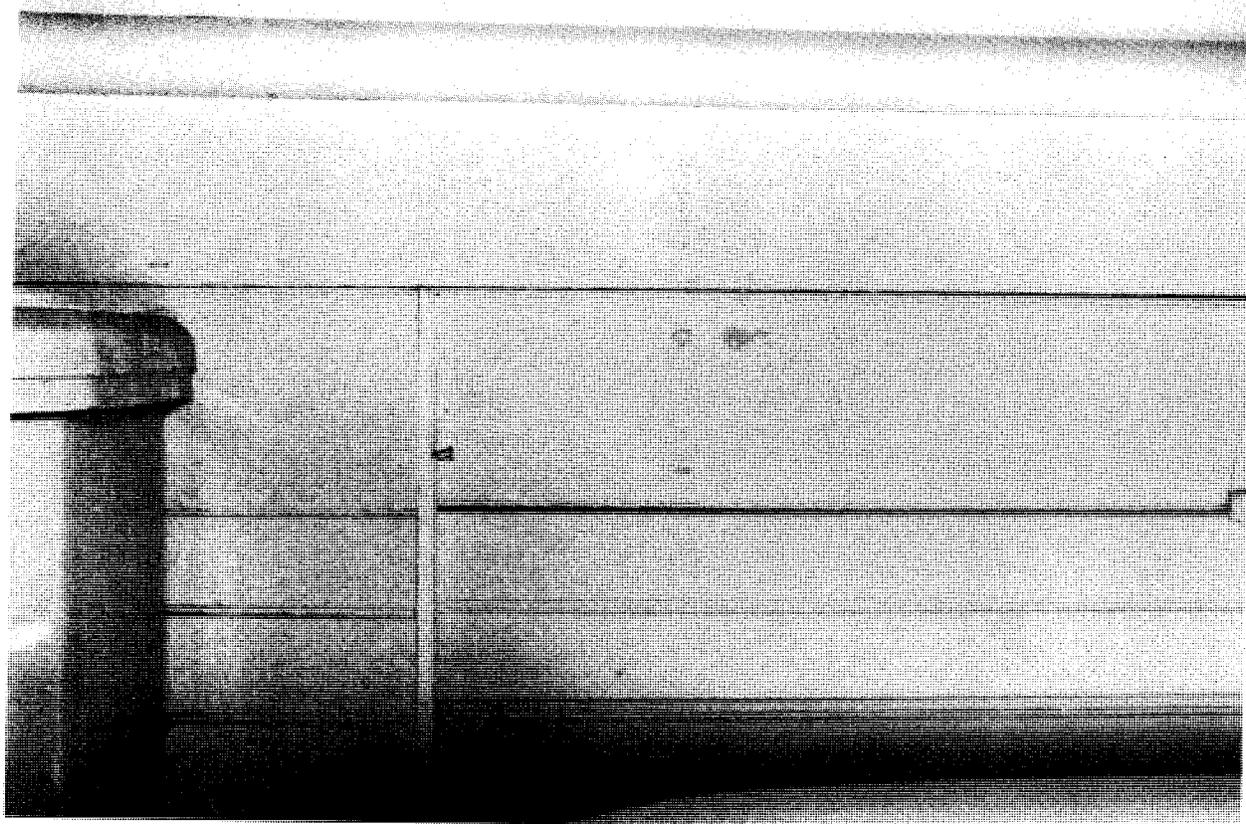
Penniman House: Bathroom (Room 207), East Wall,
